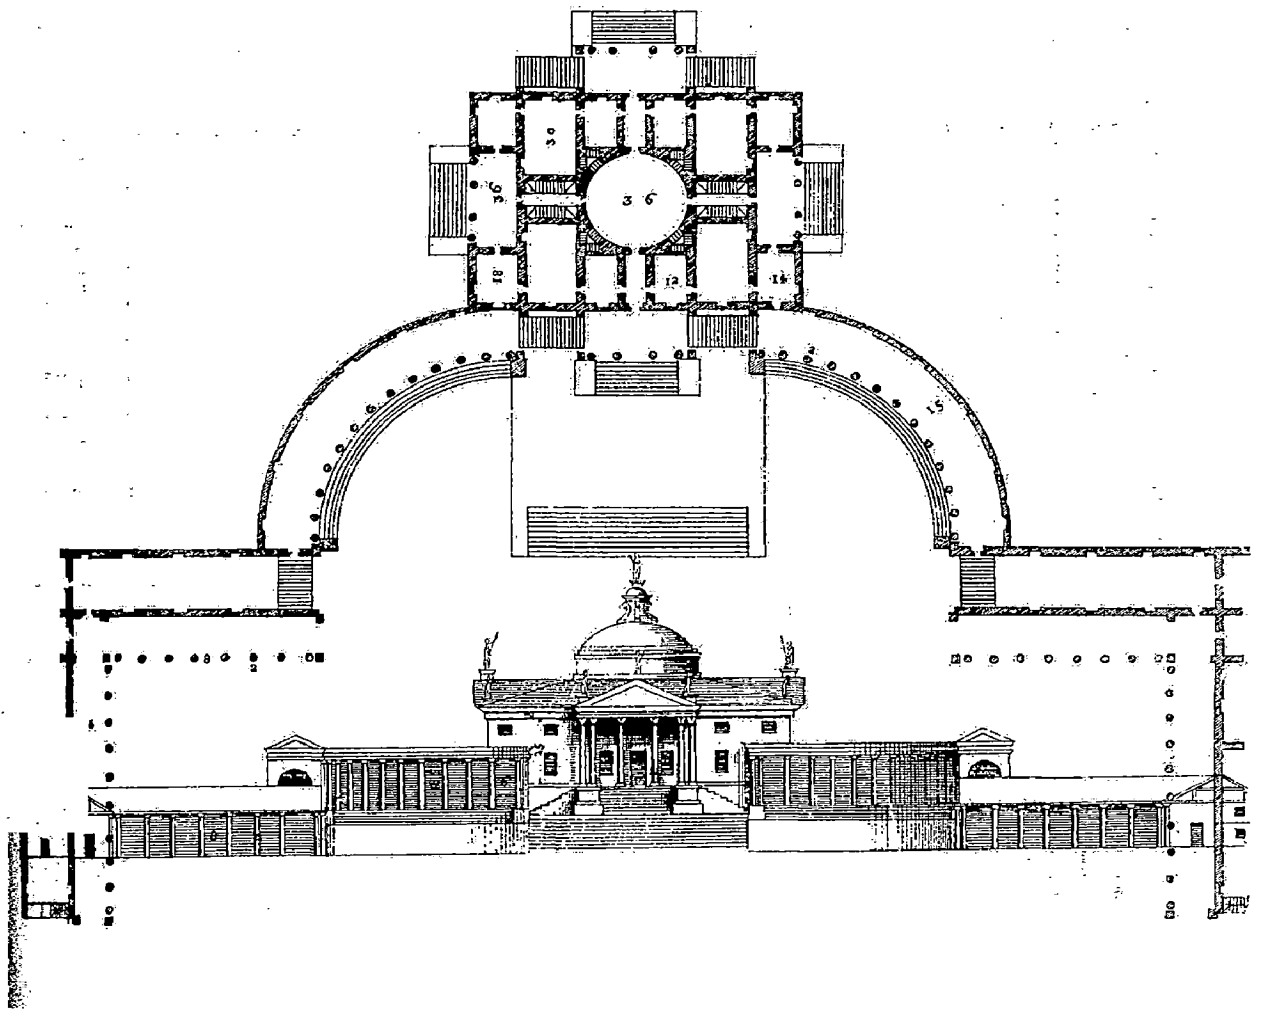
Villa Francesco and Lodovico De Trissini at Meledo in plan and elevation
